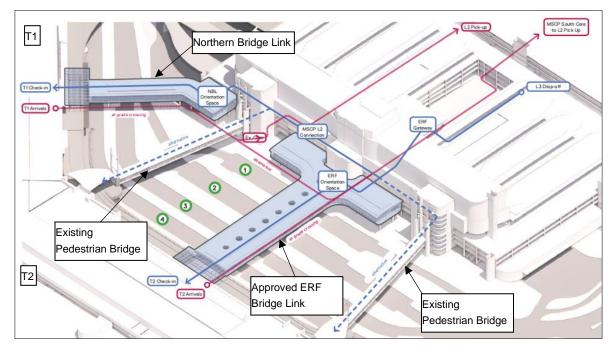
Aerial view of proposed Northern Bridge Link connecting over Arrival Drive to T1 Departures (view north-east)
